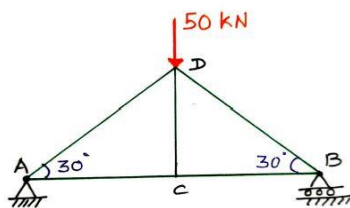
(Repeated): Pin-Jointed Plane Truss
